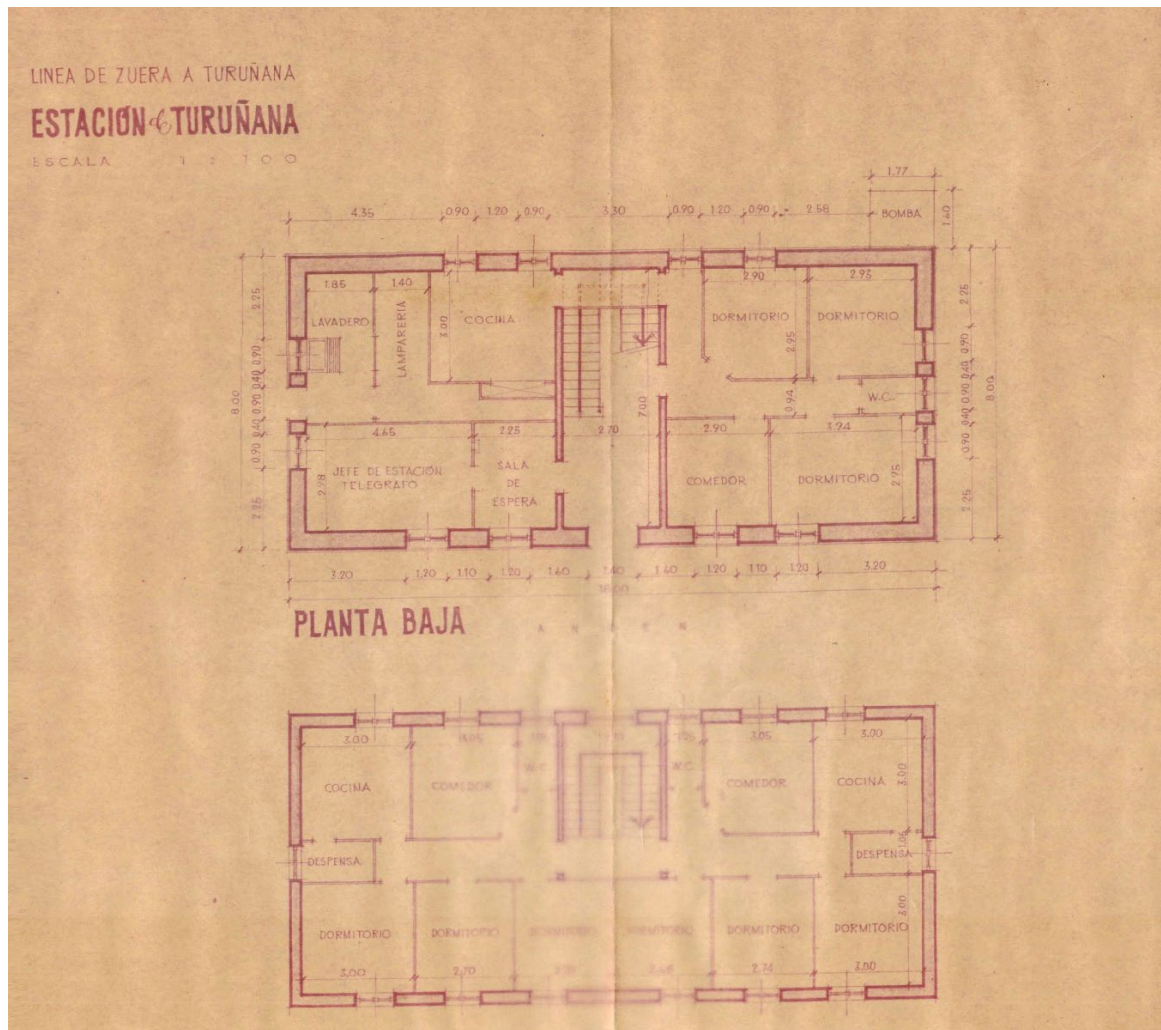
Floor plans of the Turuñana station passenger building. Source: AZAFT Archives
